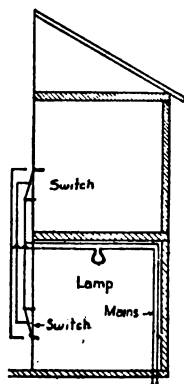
UP-STAIRS AND DOWNSTAIRS CONTROL OF LIGHT
